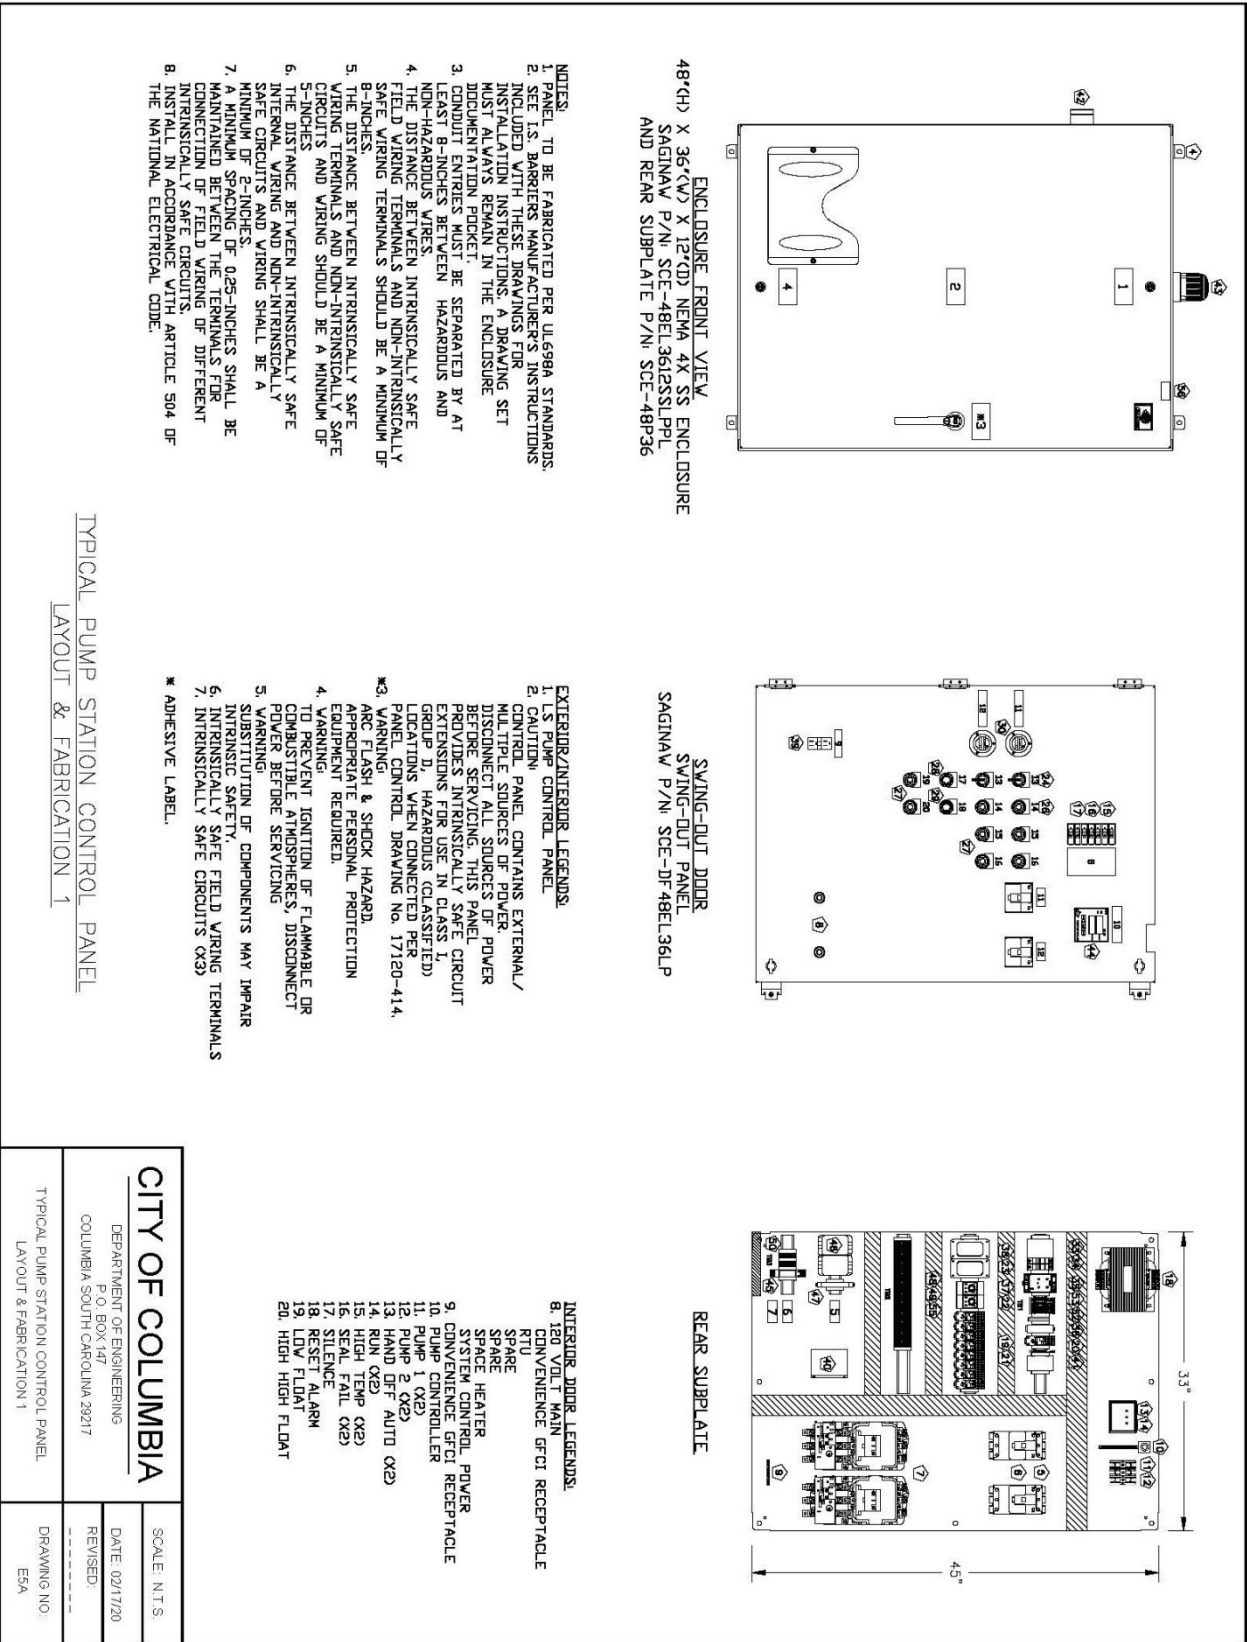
E5A - Typical Control Panel Layout & Fabrication 1
